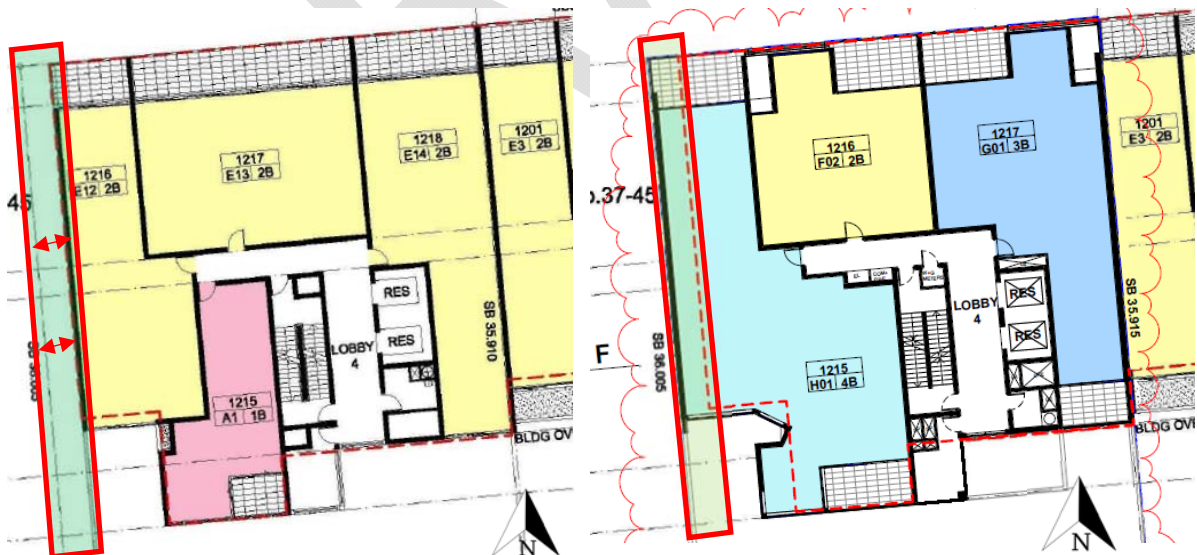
| Approved Level 12 with 1 m setback to the western boundary (left) and proposed Level 12 with zero lot line setback to the western boundary, minor amendments to the building envelope and revised concept dwelling layouts (right)
